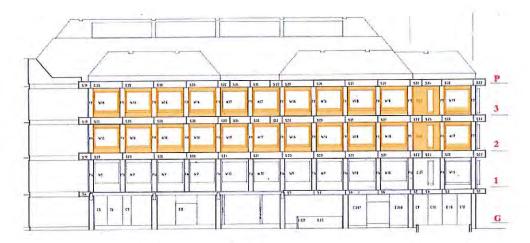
South Elevation of Block A indicating precast panels likely to be damaged at around 40 % DBE loading, assuming panel connection bolts placed centrally within oversized holes
